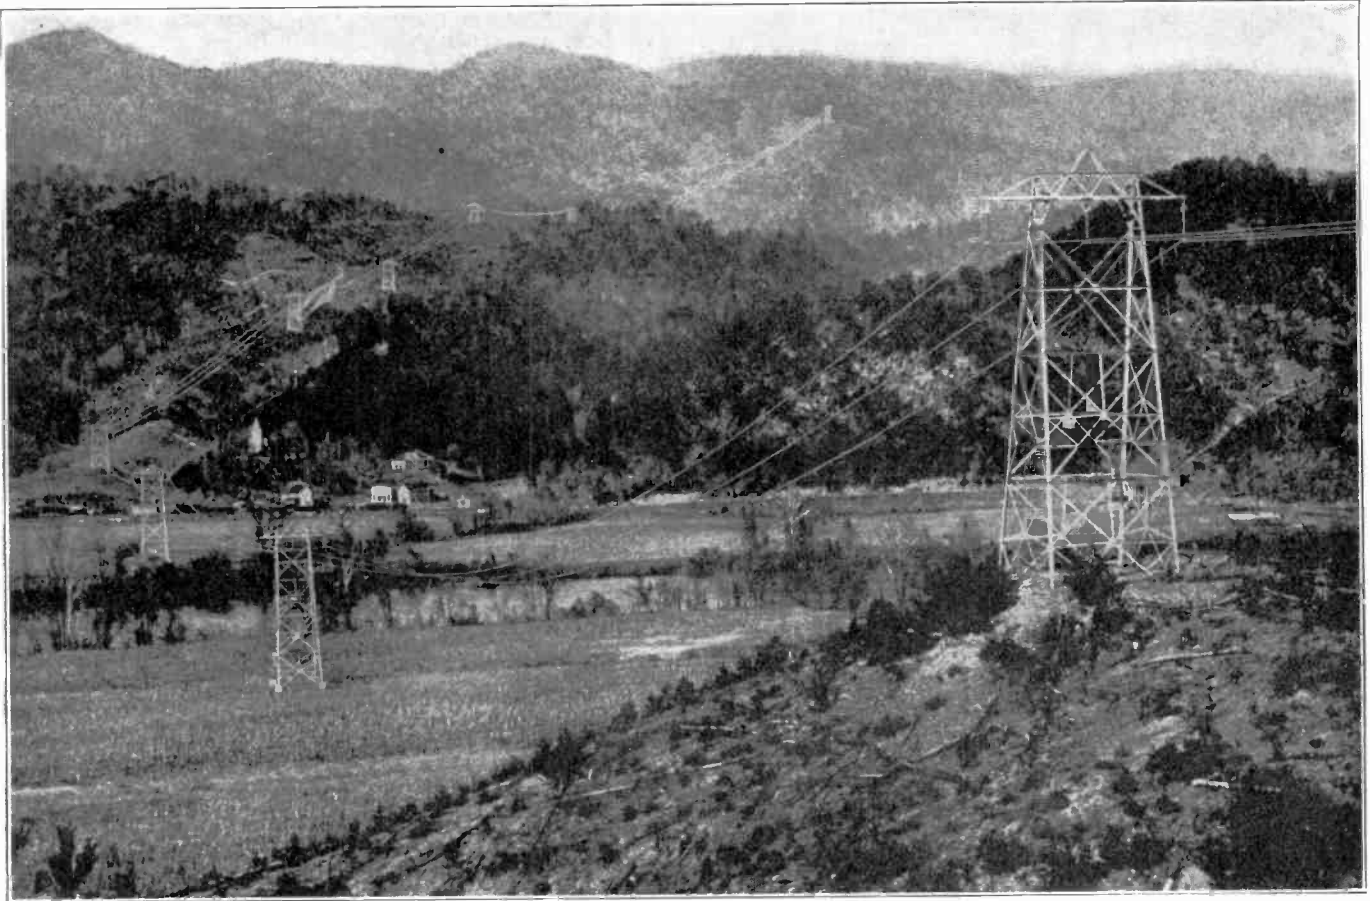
This photo shows a modern high-tension line supported on sturdy steel towers through a mountainous section of country. Note the arrangement of conductors, insulators, and cross arms on the towers.
